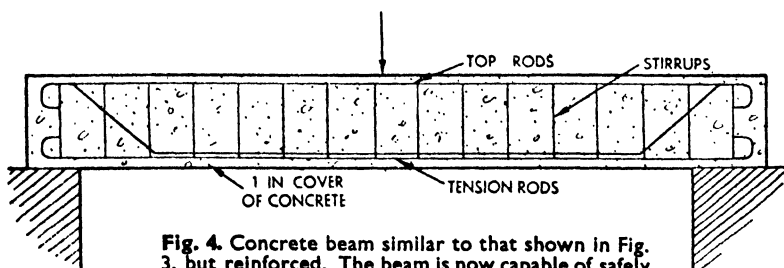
Concrete beam similar to that shown in Fig. 3, but reinforced. The beam is now capable of safely carrying a load of 6000-lb. at mid-span.
